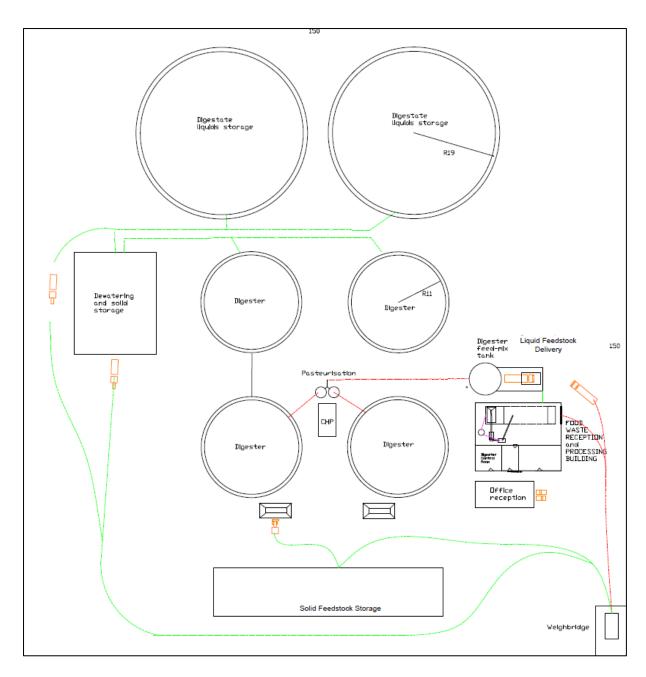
Plant layout for 40 GWh/yr AD plant with ABP treatment, CHP and CBM for onsite use.
